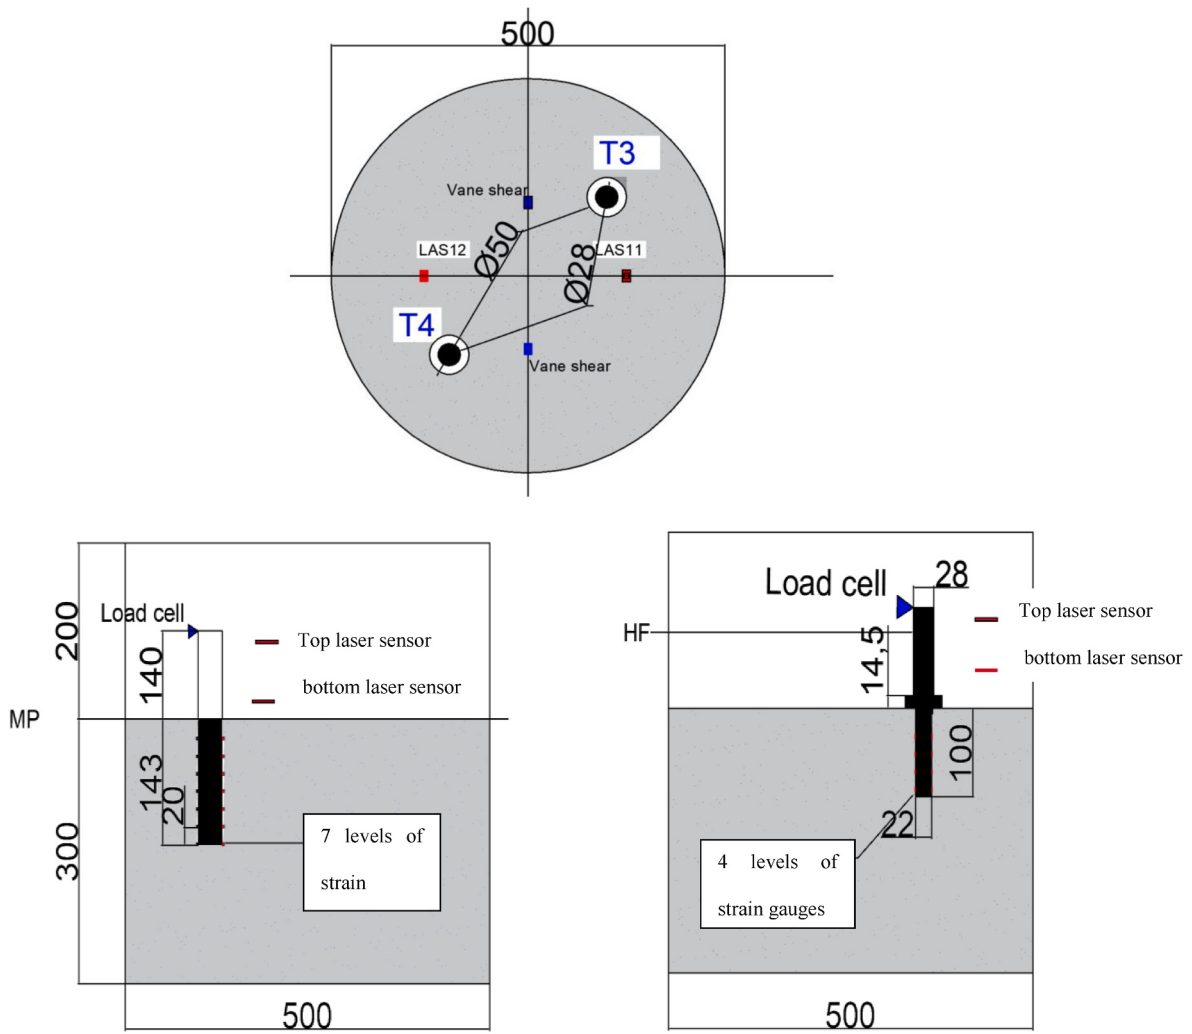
Tests arrangements, plan and elevation views (dimensions in mm).
